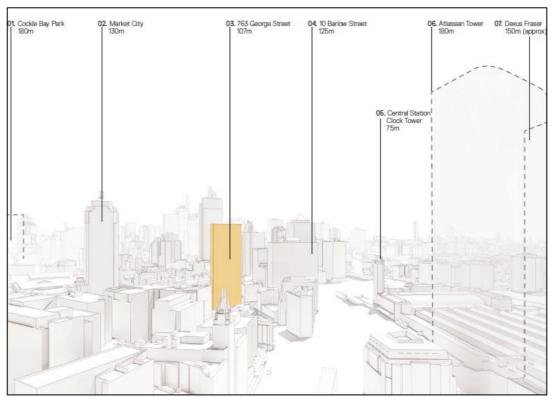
Proposal and Existing and Planning Towers Viewed Looking North Source: Grimshaw
